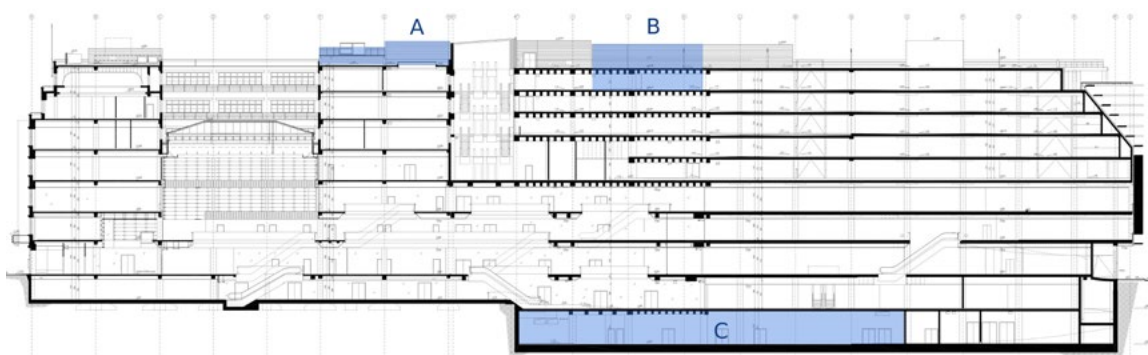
Renoma Department Store – section drawing with plant rooms indicated with light blue color (by Pracownia Projektowa Maćków).
